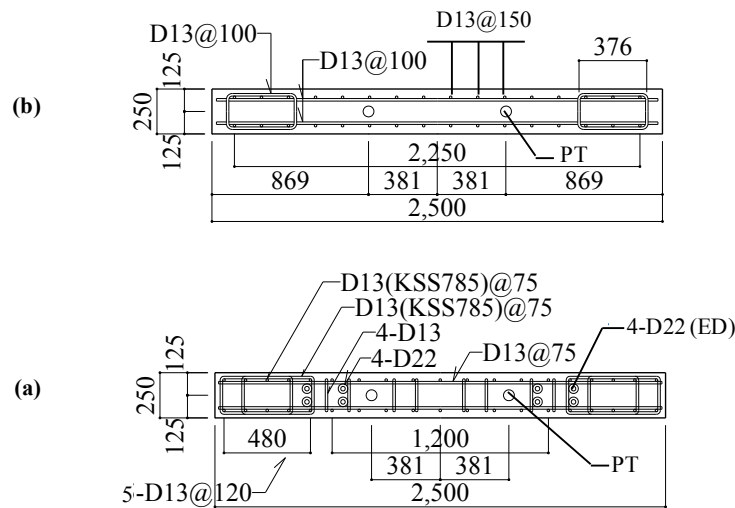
UPT Wall cross sections of (a) 1st story and (b) upper panels (dimensions in mm)
